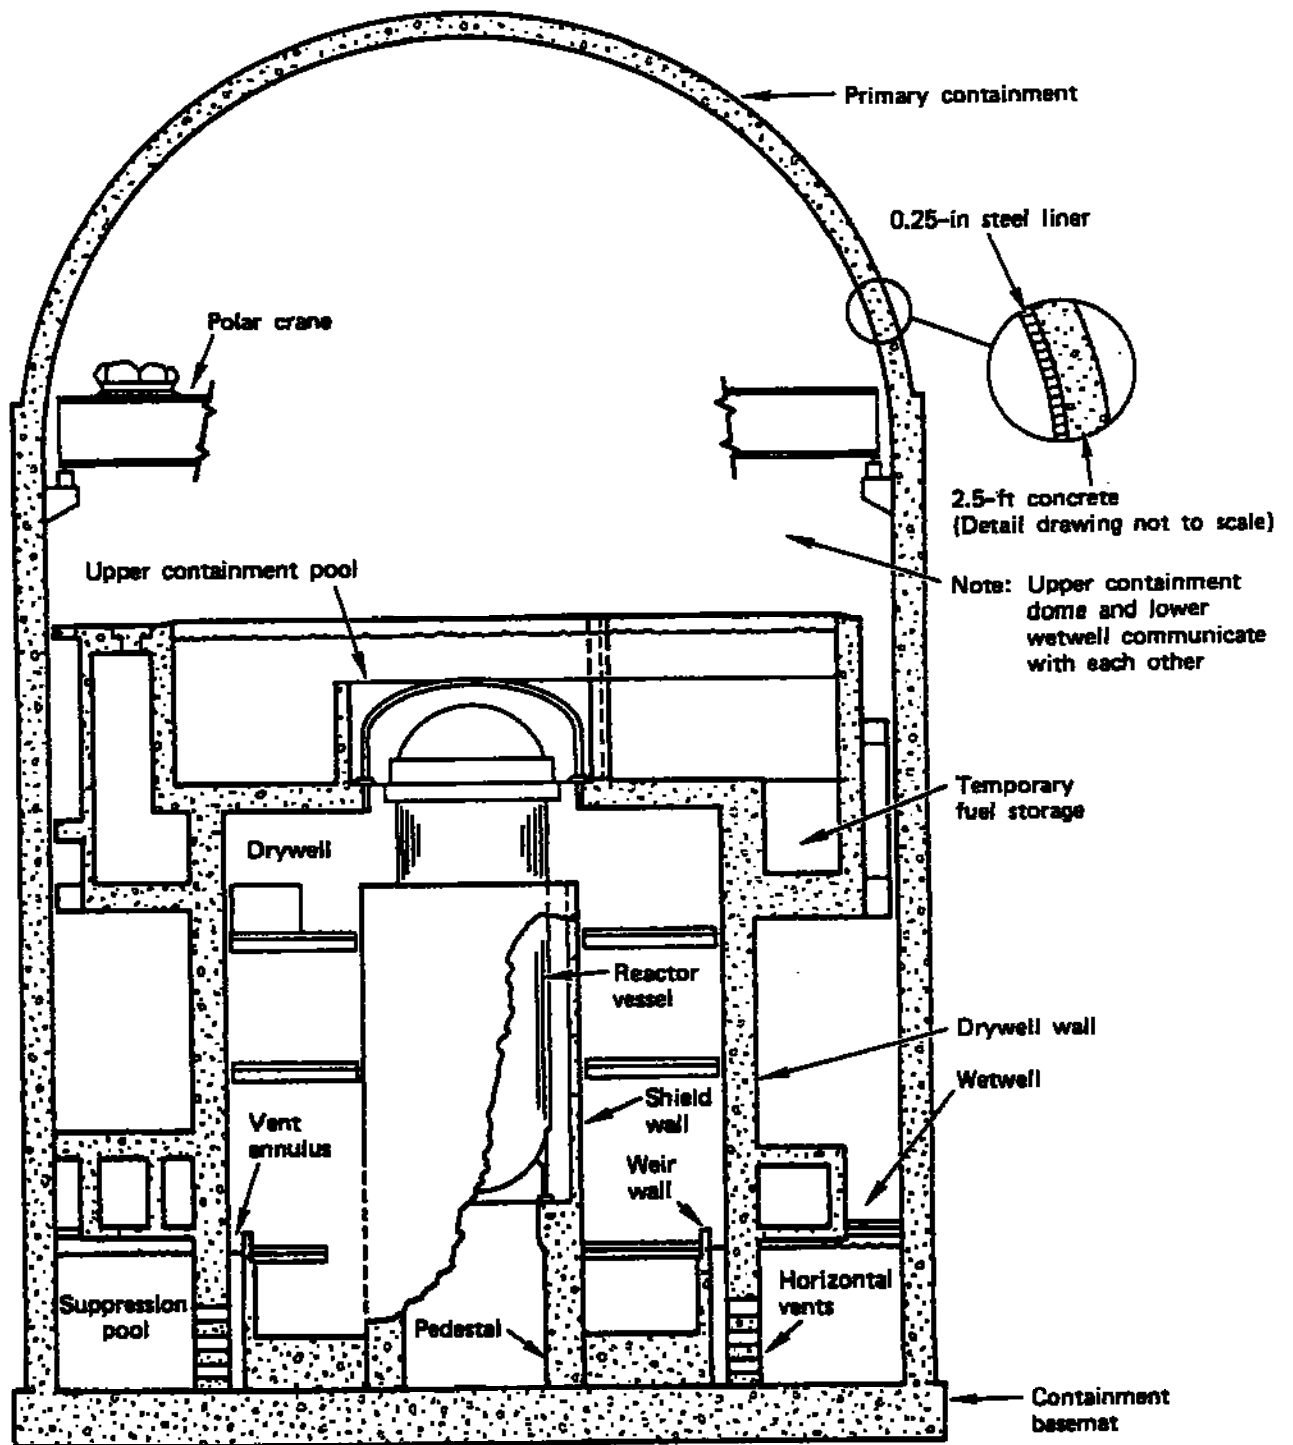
Typical BWR Mark III Containment Reinforced Concrete with Steel Liner (Clinton, Grand Gulf)
